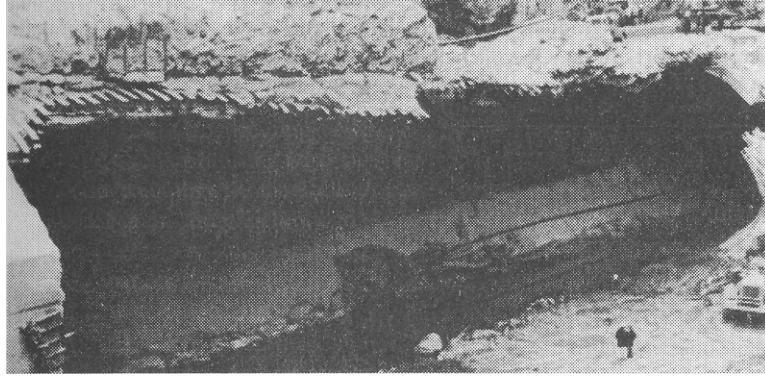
Destruction of a bypass tunnel of the Tarbela embankment dam caused by cavitation erosion (Garrod [1981])
